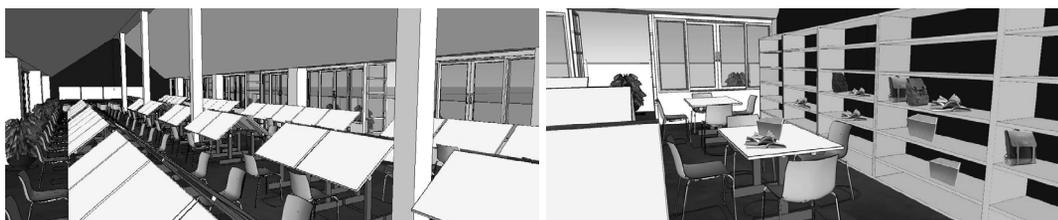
Interior Perspective AR-508 (Floor 5) studio type 2. Furniture layout design to long of studio, circulation outside in studio, relax zone and shelves to rear studio.
